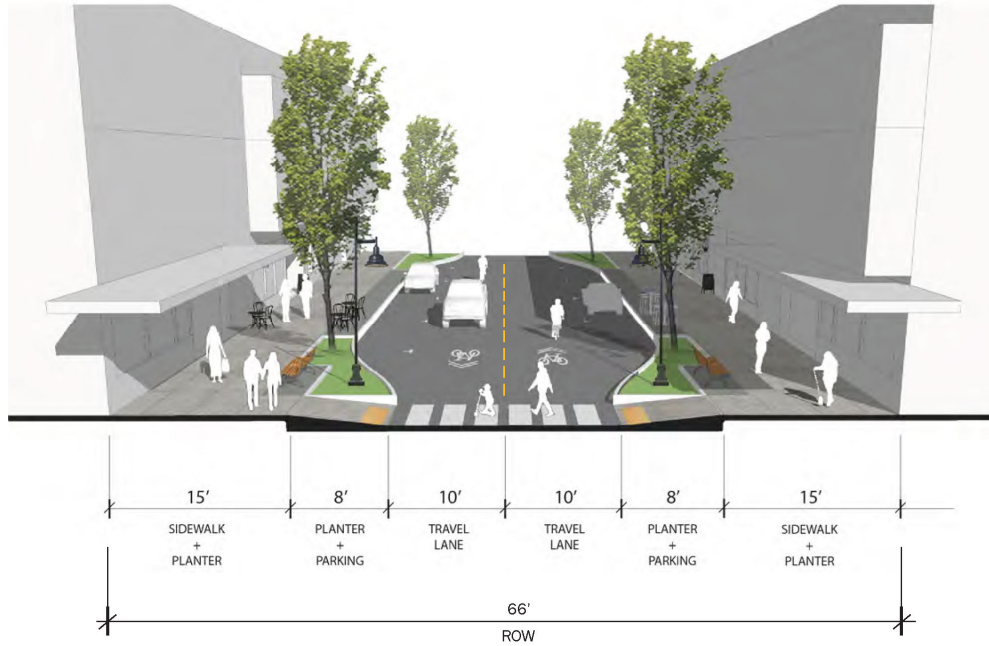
FROG POND EAST AND SOUTH MASTER PLAN CROSS-SECTIONS (CONT.)
